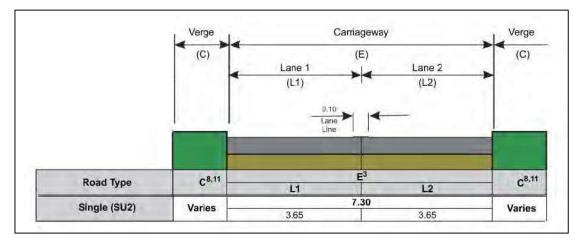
Carriageway Cross Section (DMRB TD 27/95 Extract)
